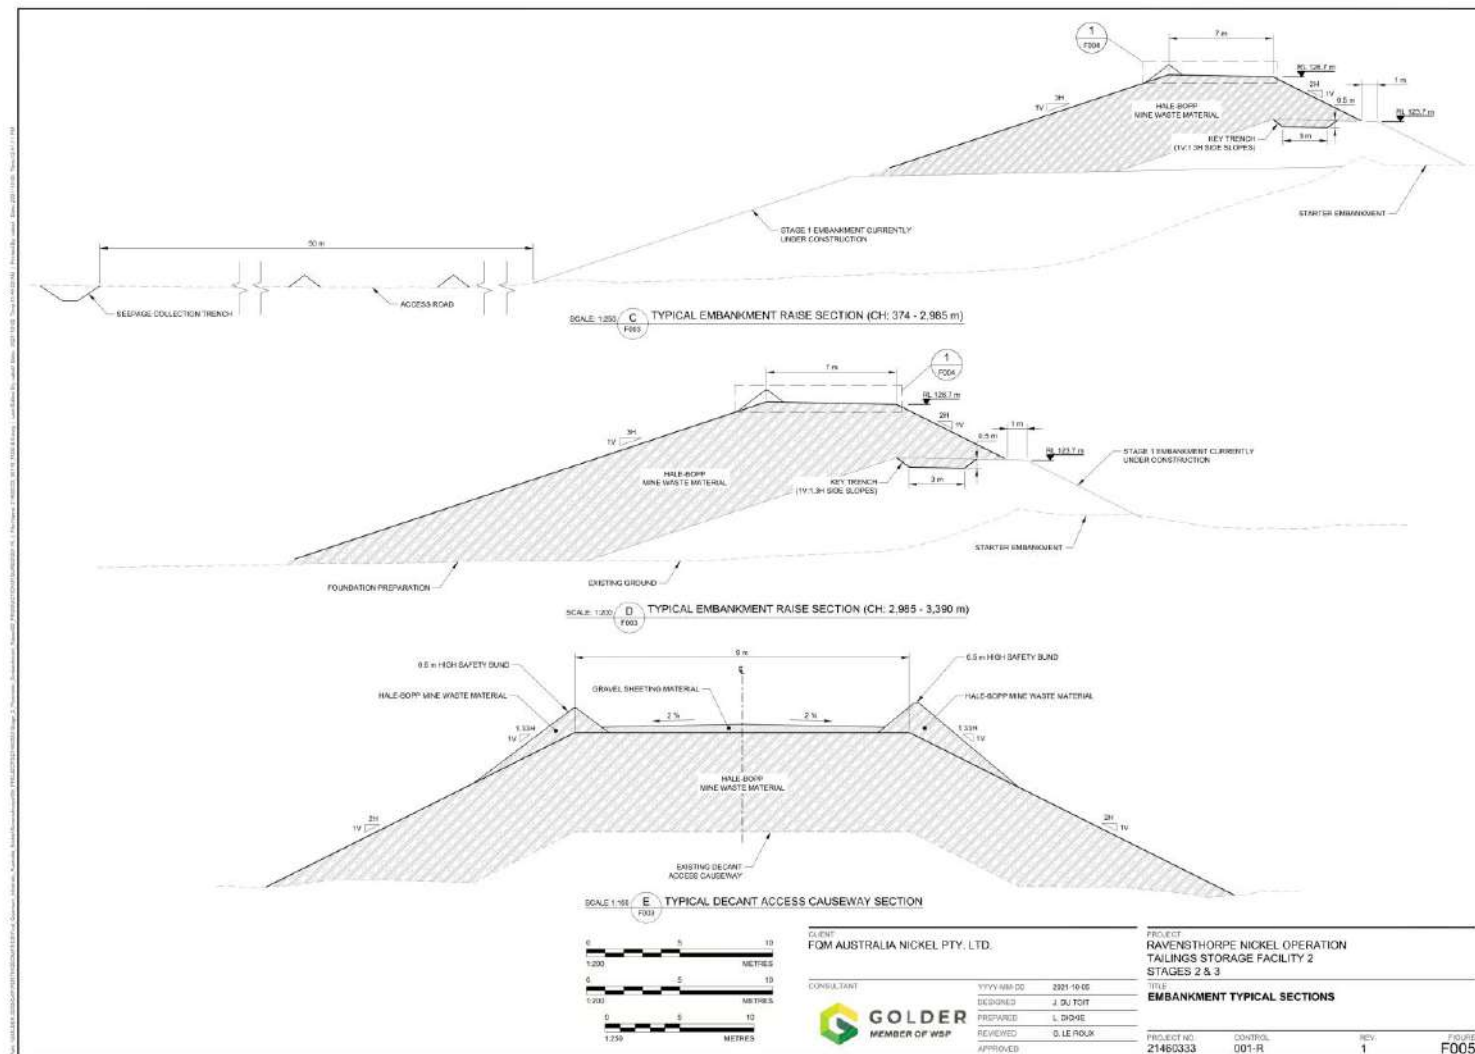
TSF2 embankment raise and Decant Access Causeway construction
